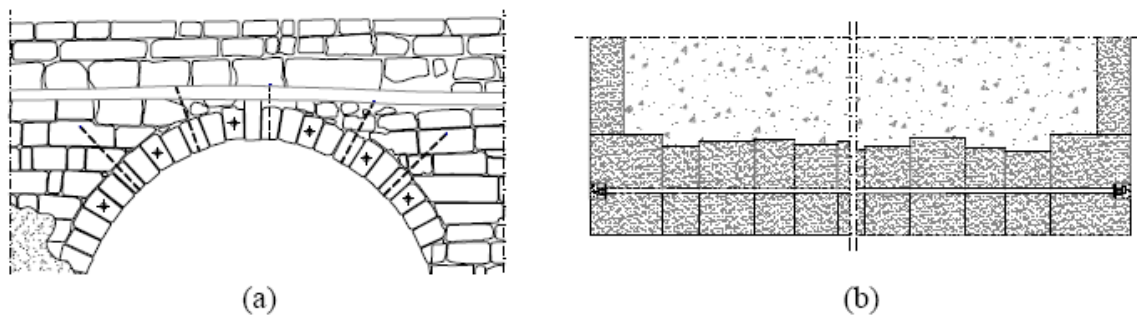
Negrelos Bridge, Guimarães Strengthening of the central arch: (a) adopted anchor scheme; (b) full bridge width anchors.
